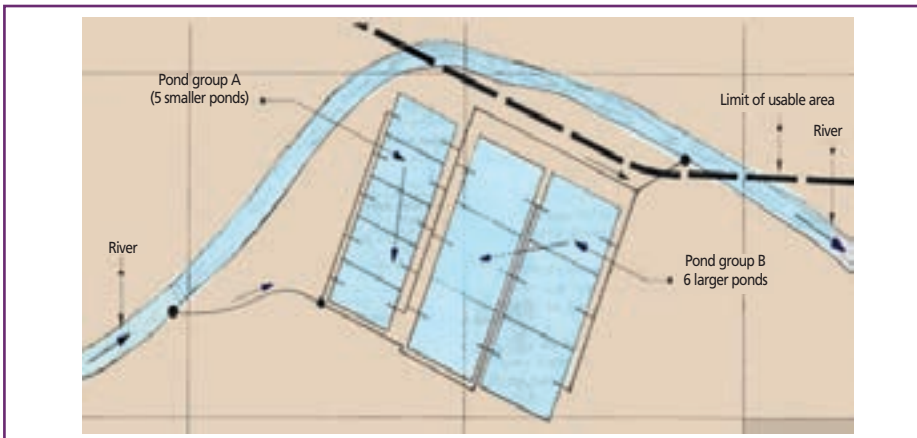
Pond layout plan with derivation system from both sides (parallel ponds)
